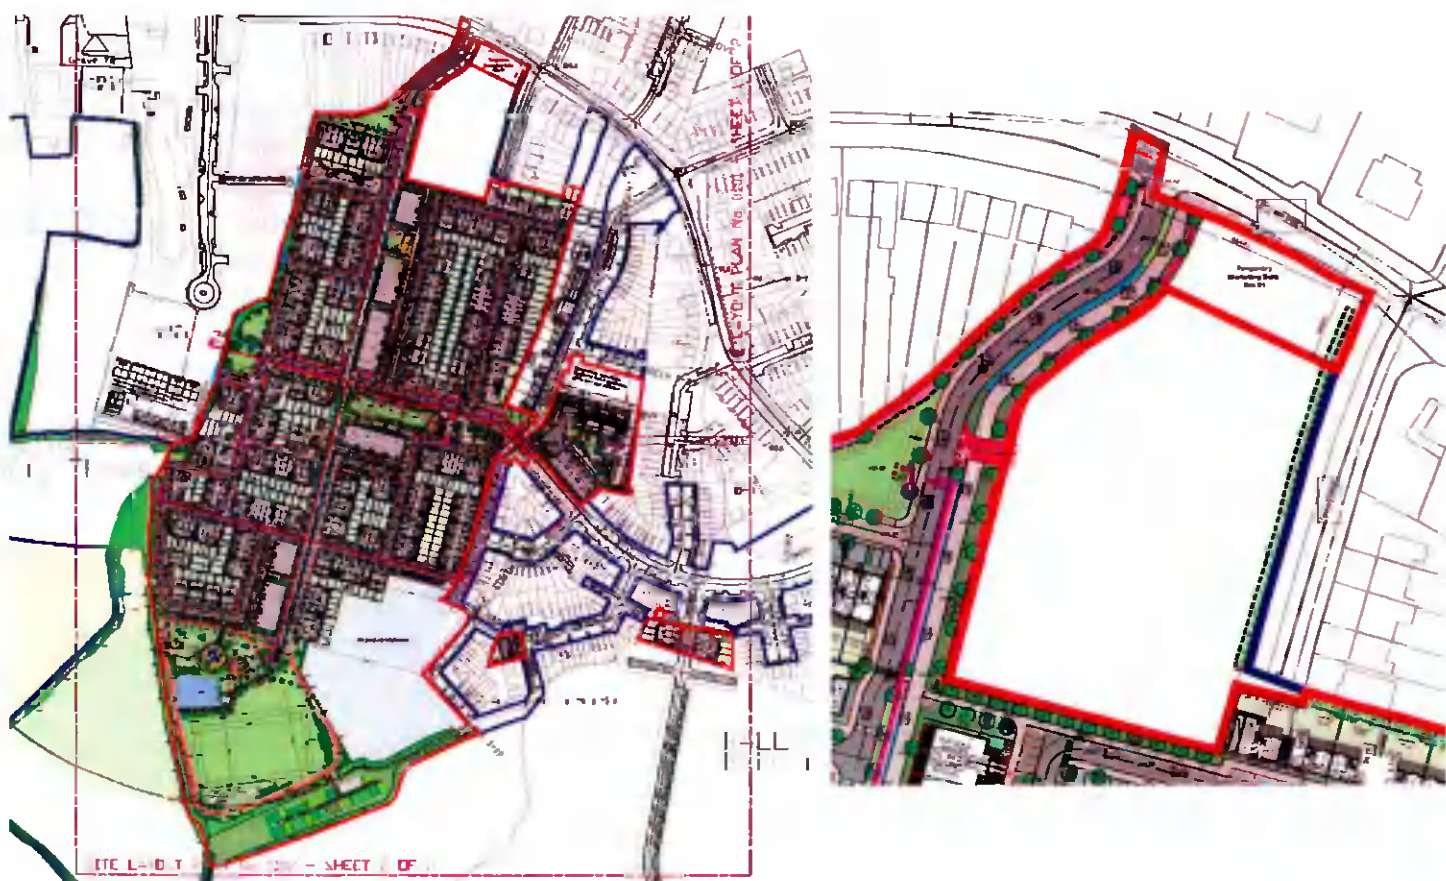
Extracts from site layout plan showing overall site layout on the left and a close up of the subject site on the right.
